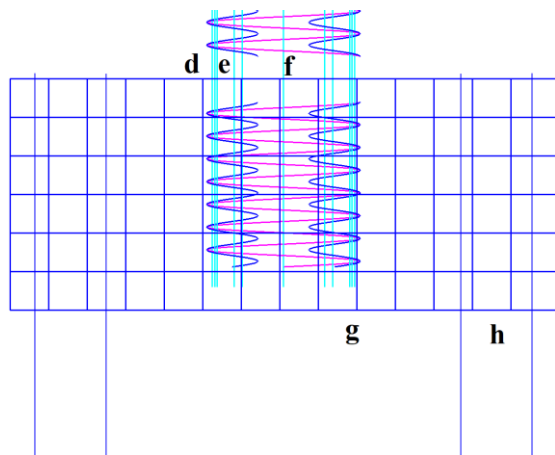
Detail of the foundation. d) longitudinal column reinforcement (20 bars), e) 4 small diameter spirals, f) central big-diameter spiral, g) reinforcement of the anchoring blocks and h) pre-stressing bars.
